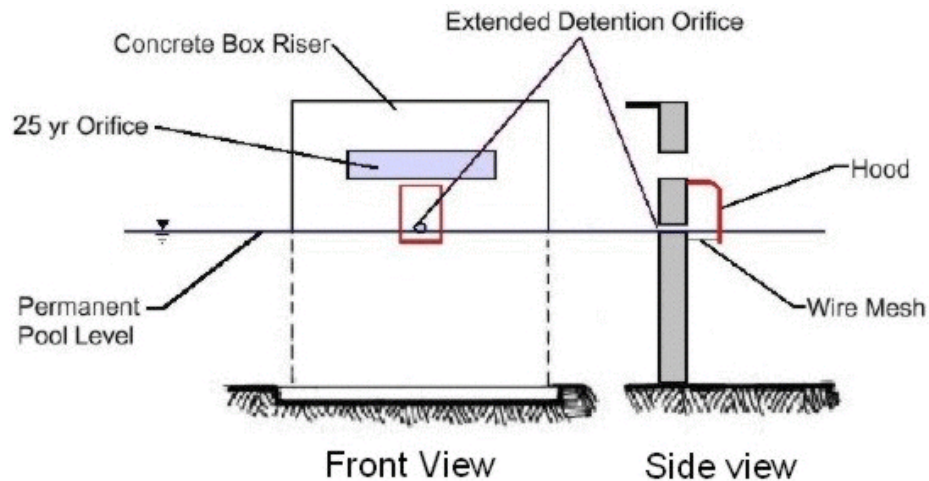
Typical Outlet Structure: Multiple Orifice Hooded Outlet (Haubner et al., 2001)
